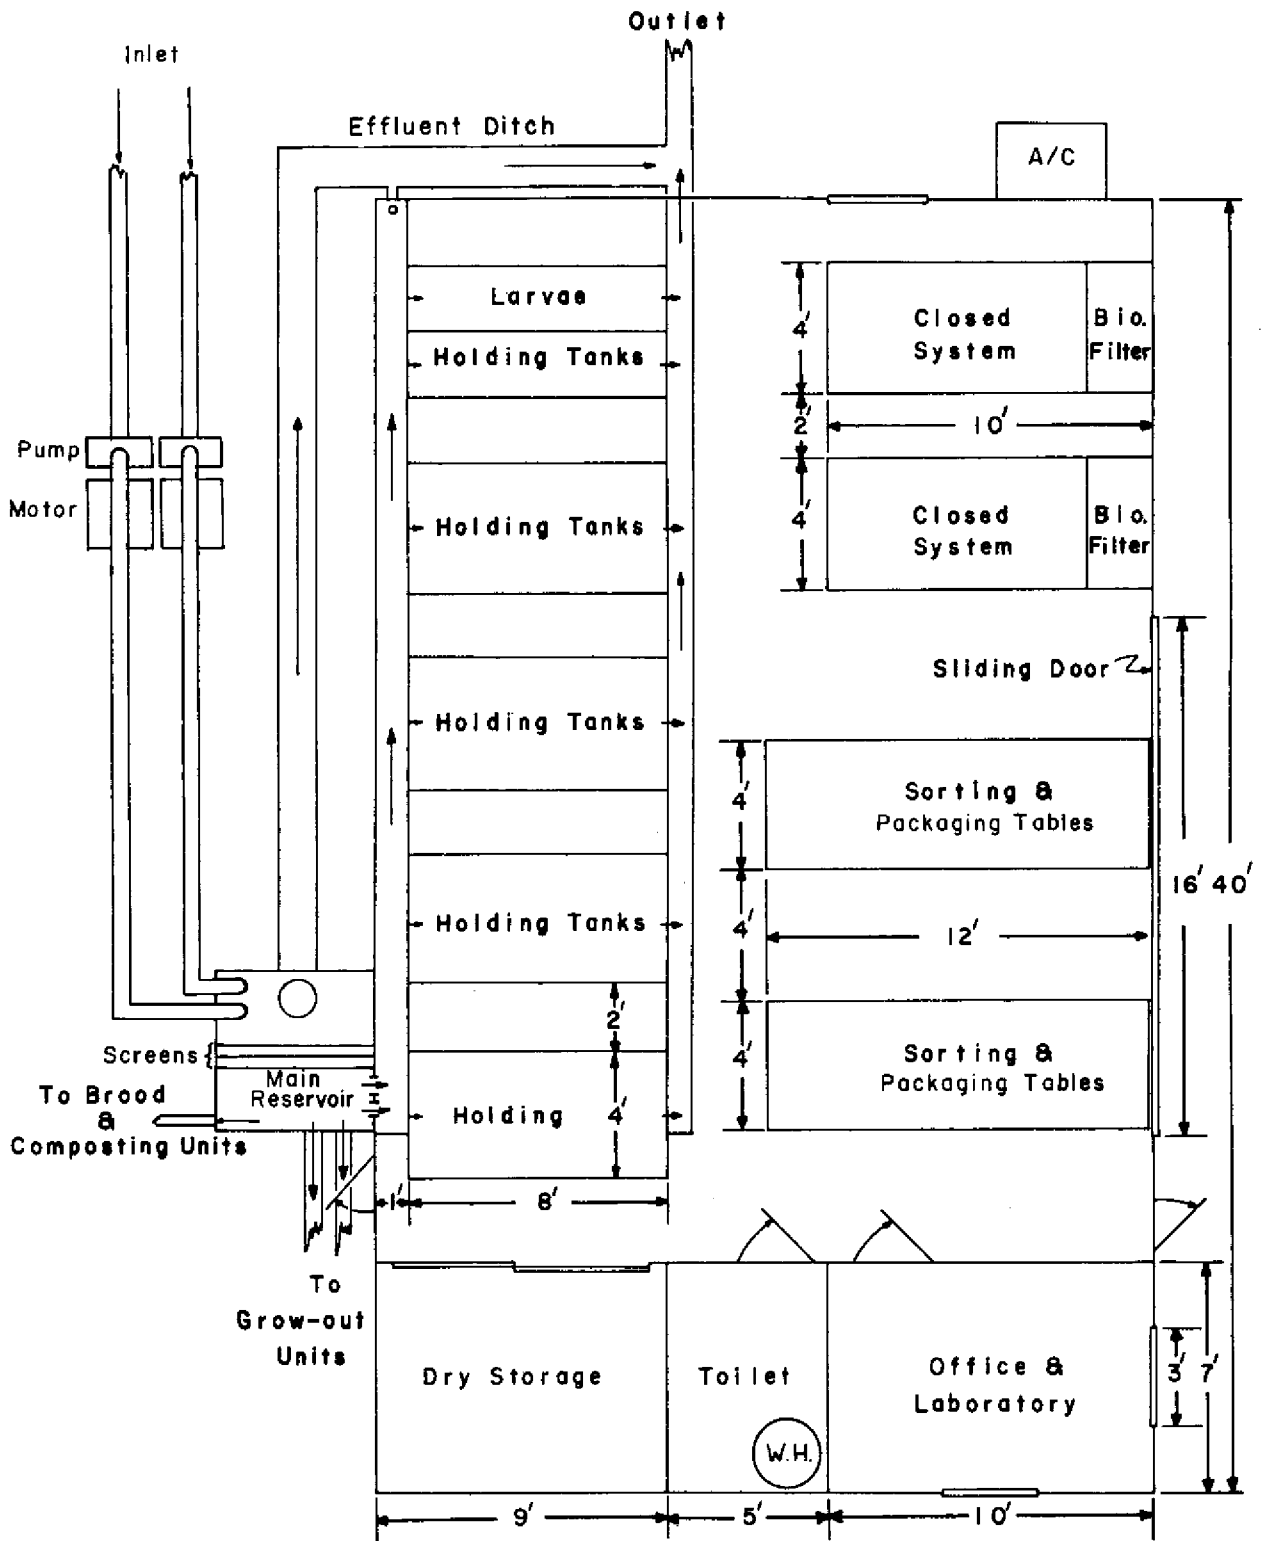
Floor plan of the proposed service building shown with plumbing to match Option 1. The same floor plan would be used in Option 11 but only one 150 gpm pump is required.
